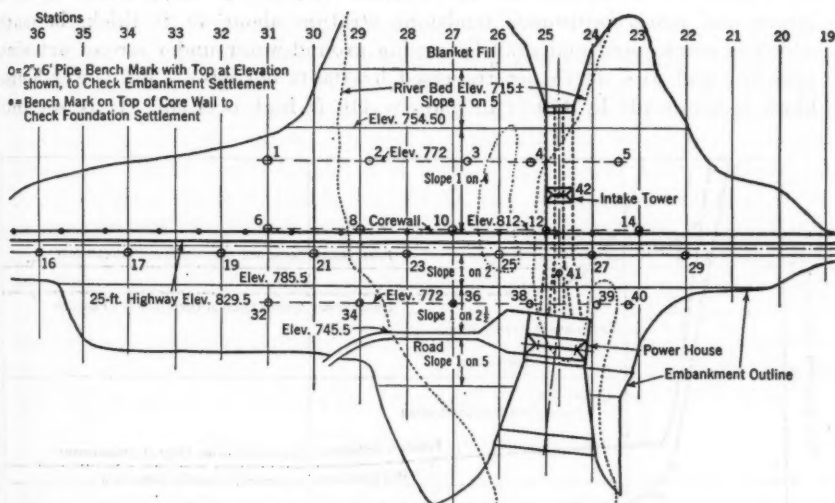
SETTLEMENT RECORD OF HARDY DAM; PLAN OF STATIONS AND BENCH-MARKS (SEE TABLE 1)
